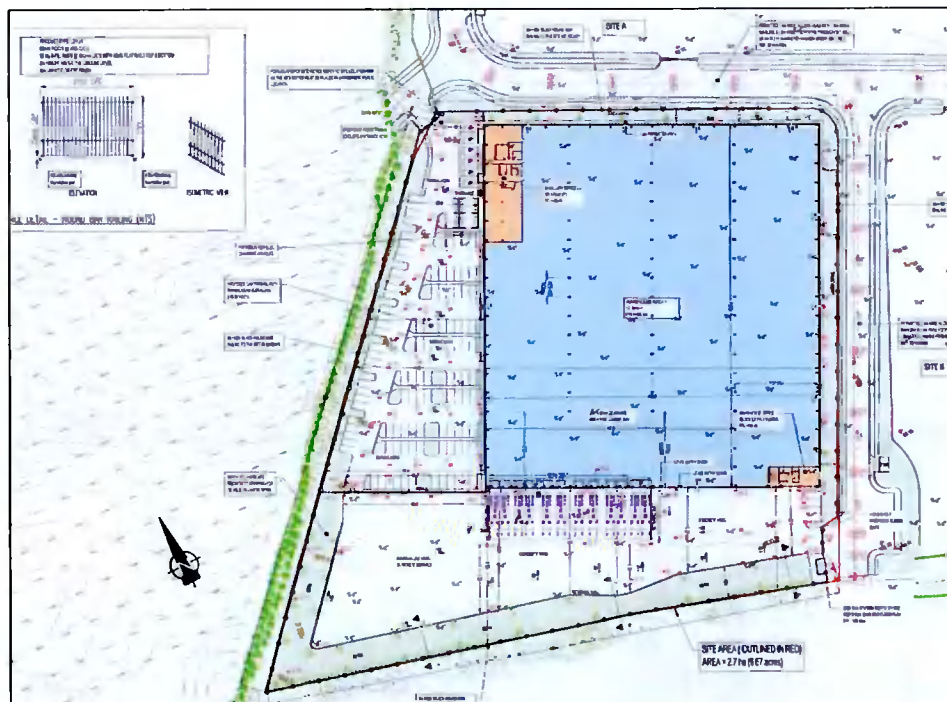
Site Plan of the Extant Scheme at the Subject Site (SDCC Reg. Ref. SD19A/0407).
